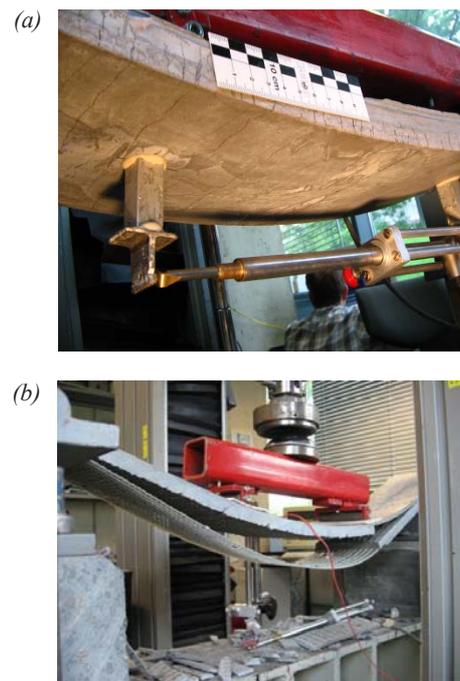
Concrete cracking (a) and concrete spalling (b) during the bending test [9]
